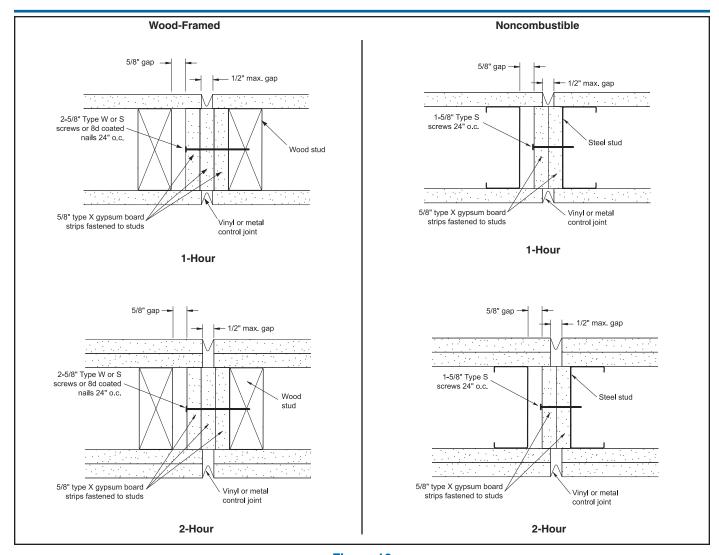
Control Joint Details (WHI-651-0318-1, 3/20/90; UL R4024, 96NK13566, 7/29/96)
